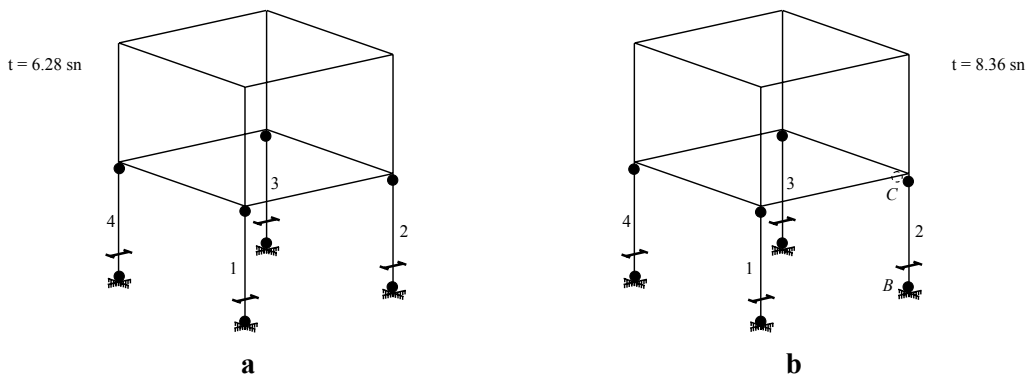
The locations of plastic hinges of two story frame subjected to San Fernando earthquake (a) rigid connections, (b) semi-rigid connections
